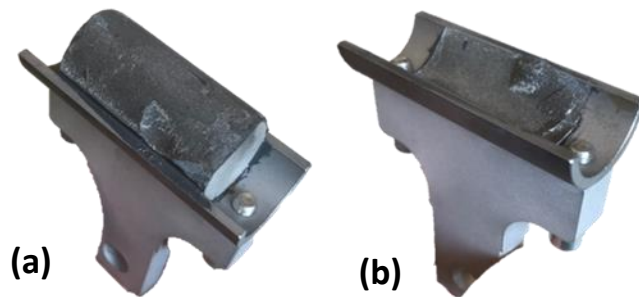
DTS results. There is assumed failure at the bond-surface interface. (a) Bottom test fixture. (b) Right is the top test fixture.
